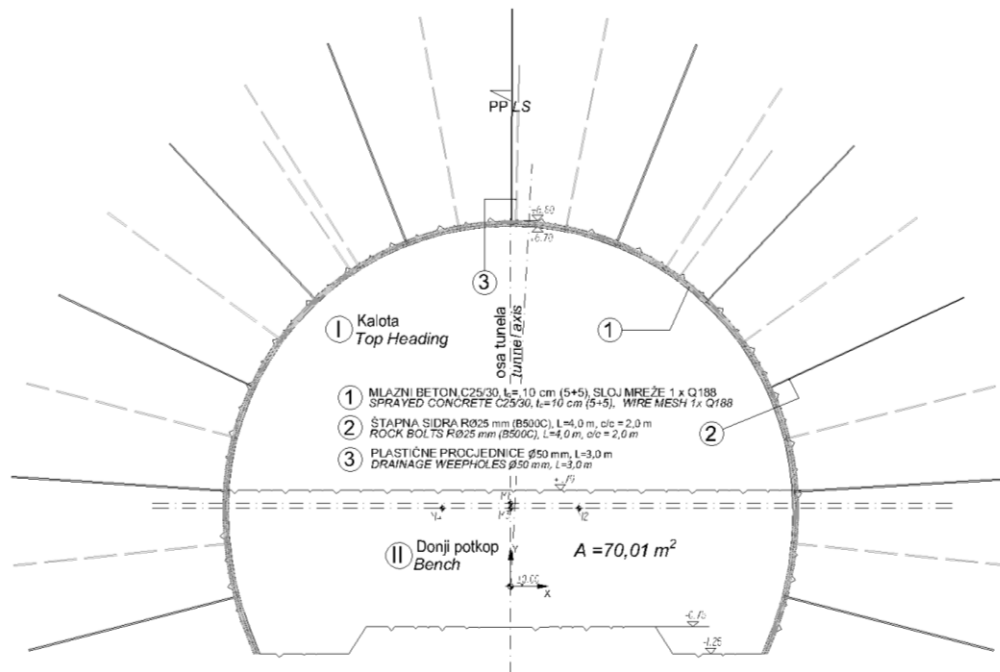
Typical cross-section of the tunnel with the initial lining (support system)
